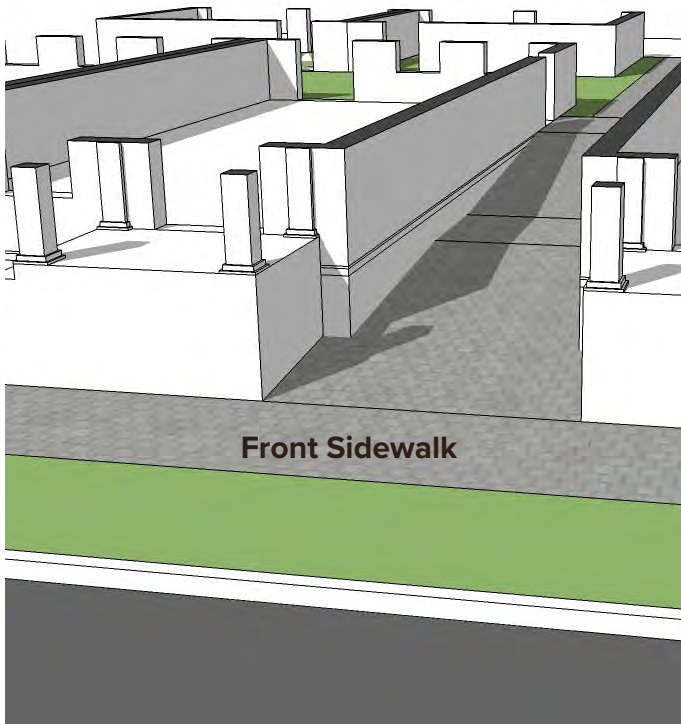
A subtle and well-integrated ramp set behind the building's Front Façade plane.
